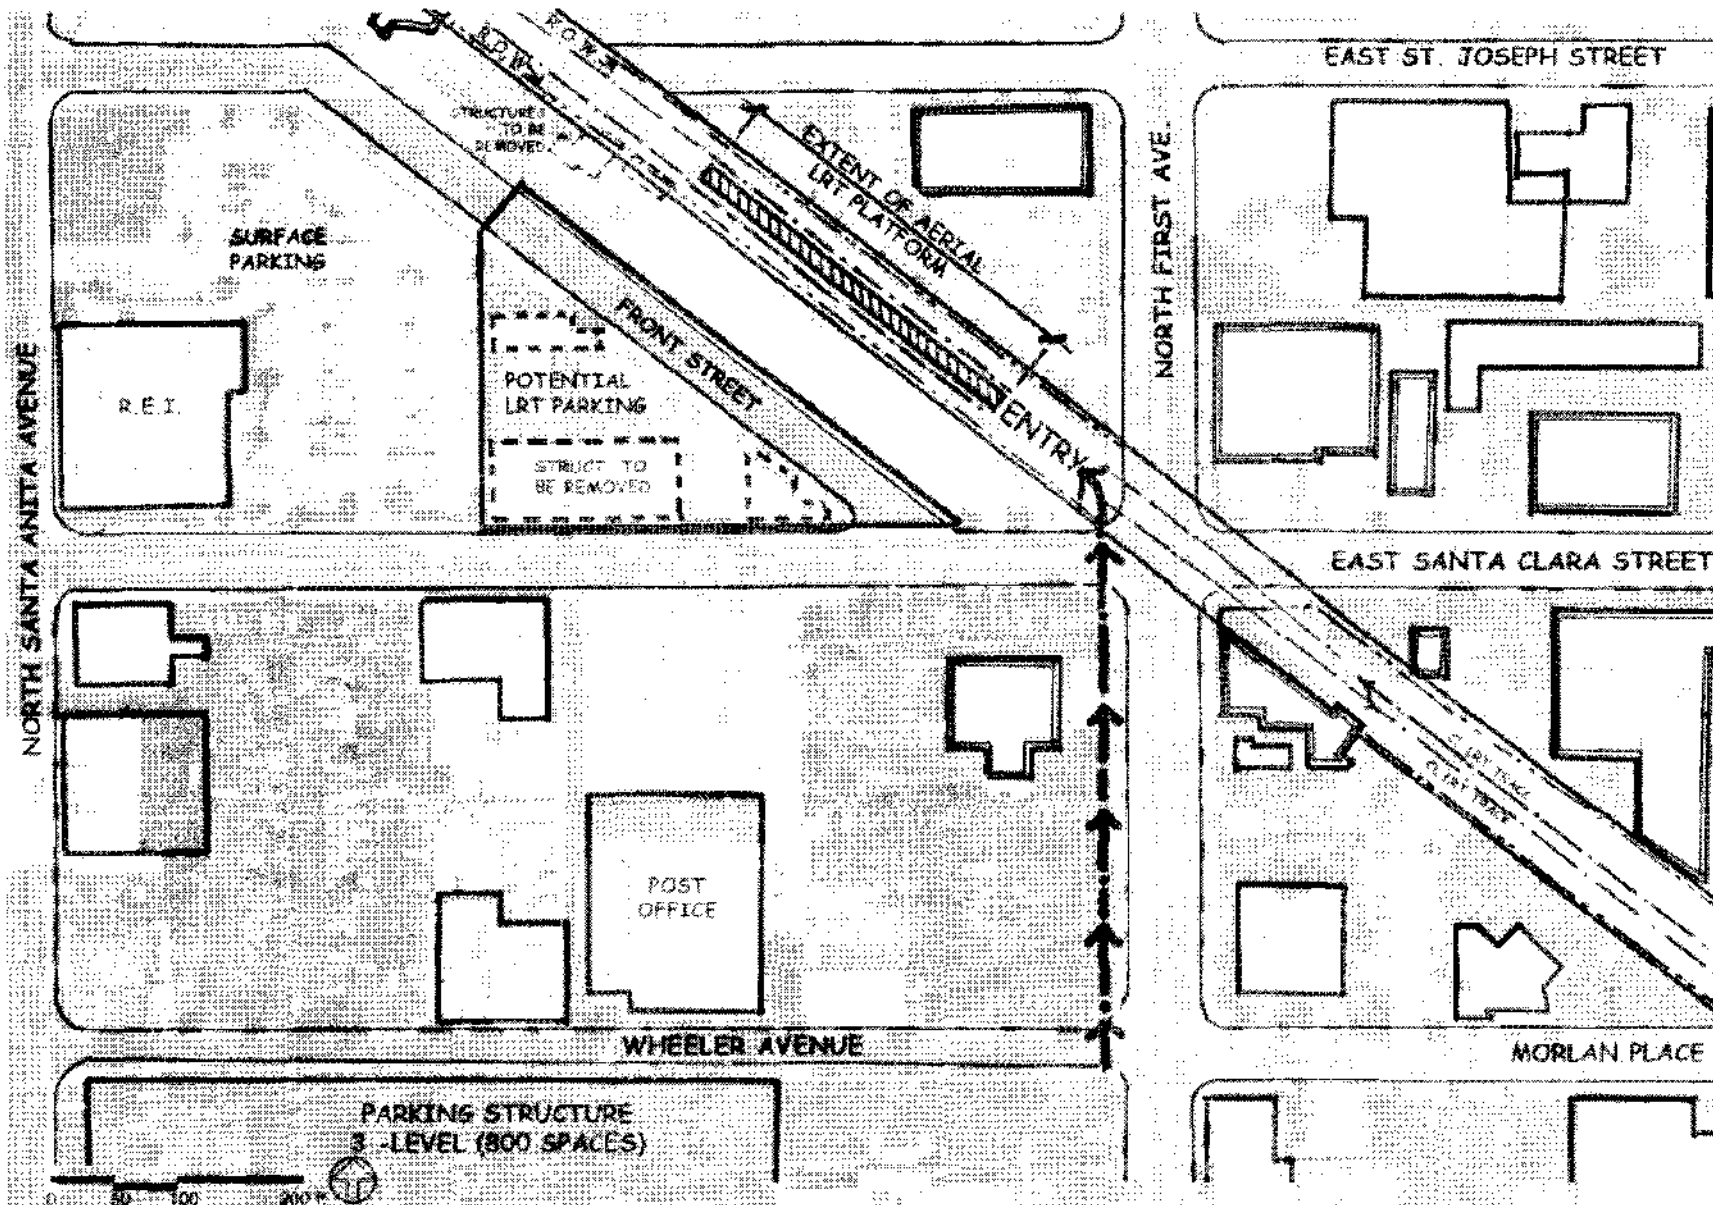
Site Plan: City of Arcadia Station, Option B
